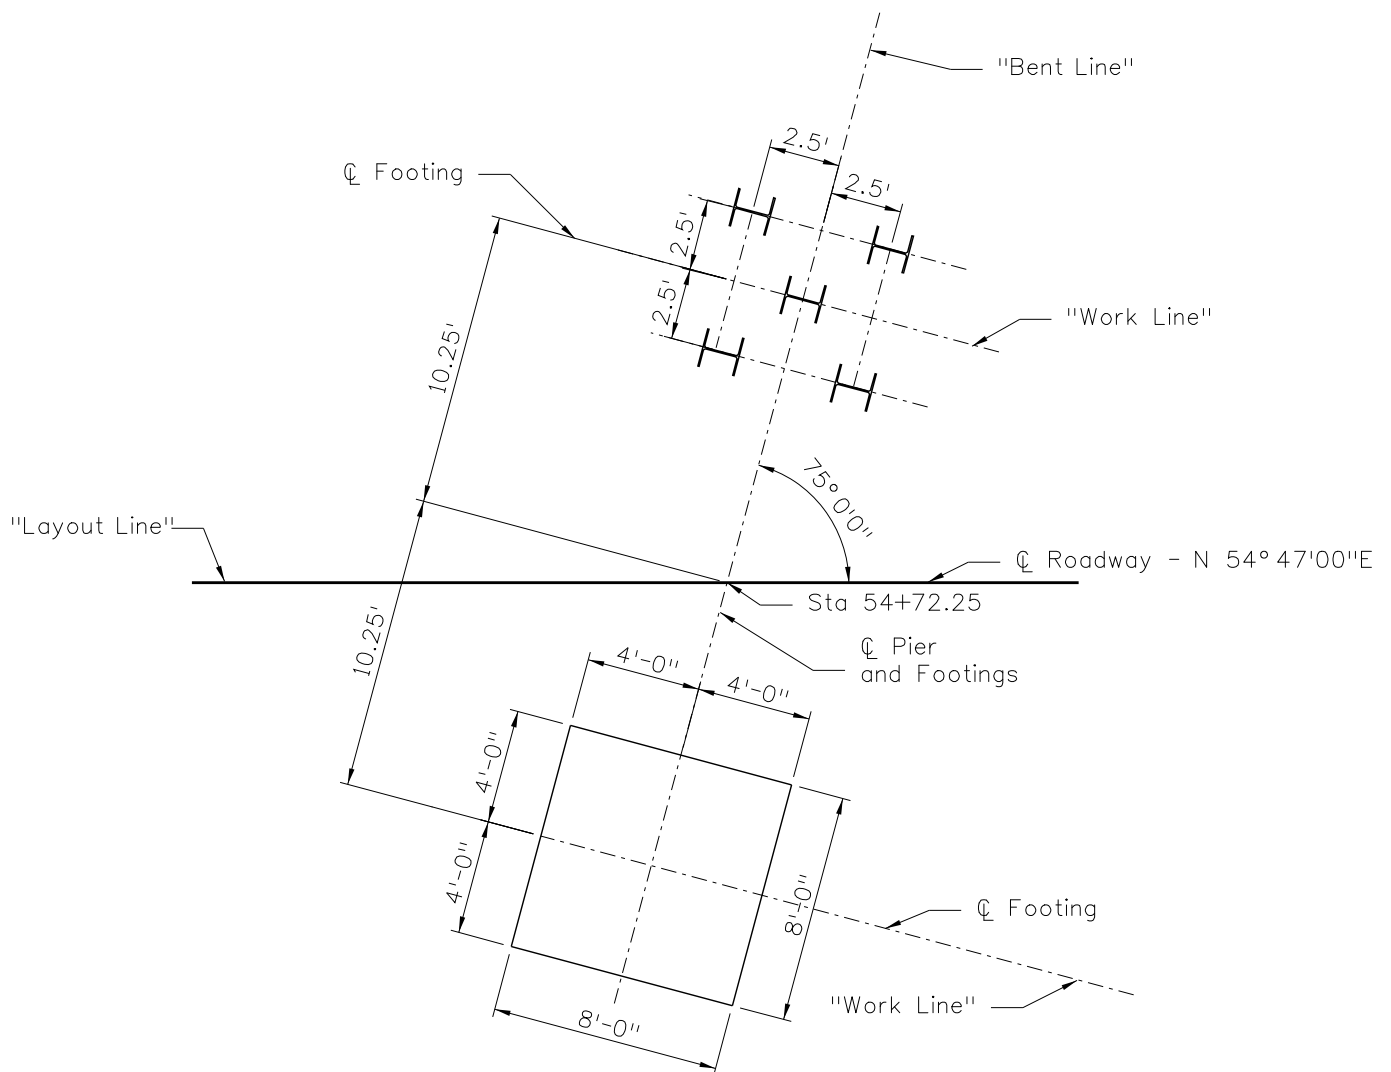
Detail of Layout, Bent, and Work Lines
